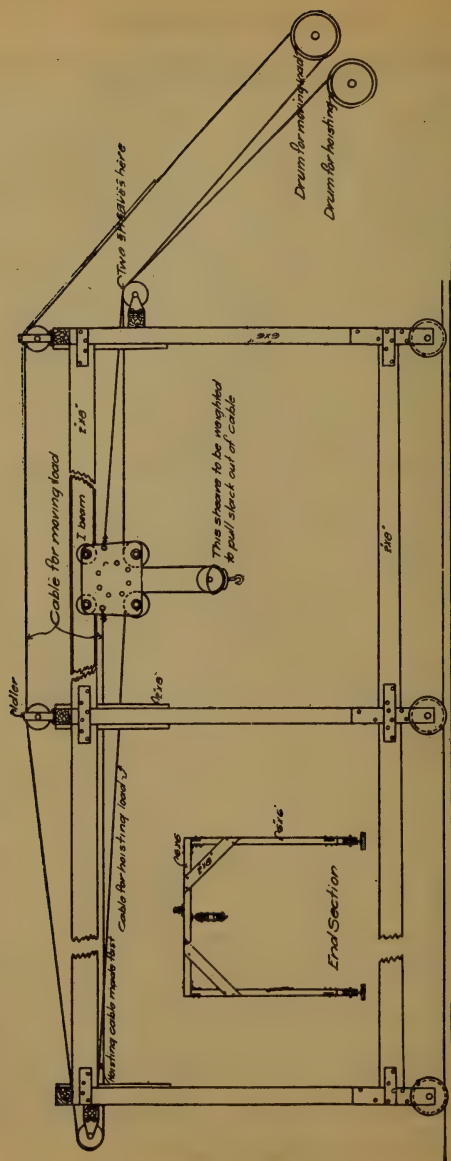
A. General Details of Trench Machine Used on Sewer Work, Jackson, Mich.
